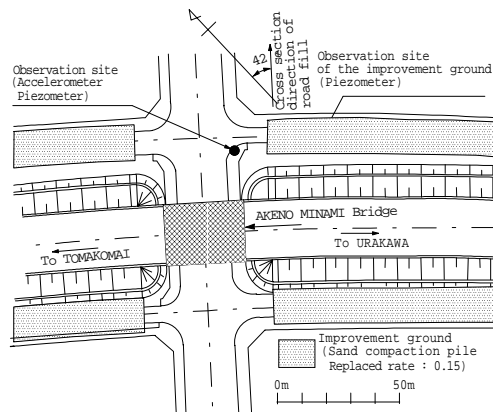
Liquefaction Array Observation Site (Sandy Deposit Site)
